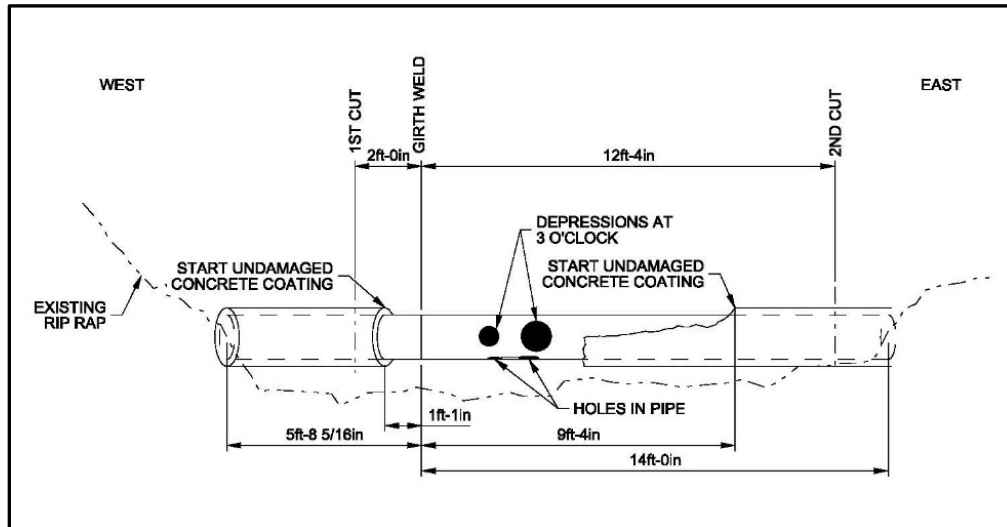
Drawing of the damaged pipeline segment and agreed upon location for cuts. Courtesy, Enterprise Products.
